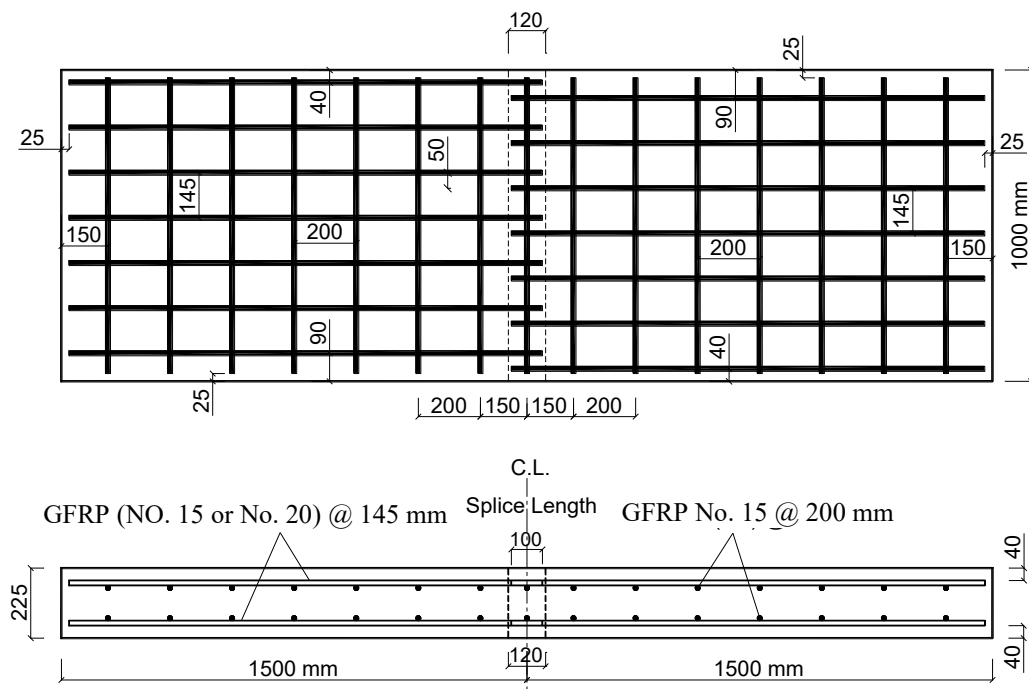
Concrete dimensions and reinforcement details of specimens G-100-15-B and G-100-20-B
